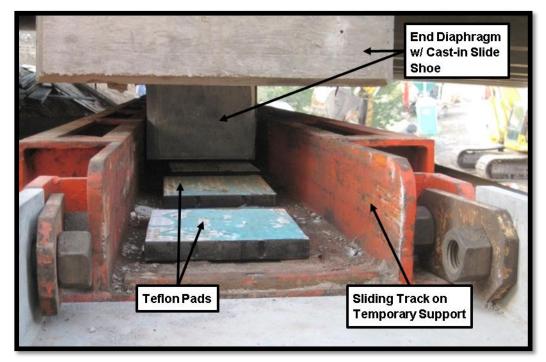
Concrete End Diaphragm on Teflon Pads in Sliding Track System
